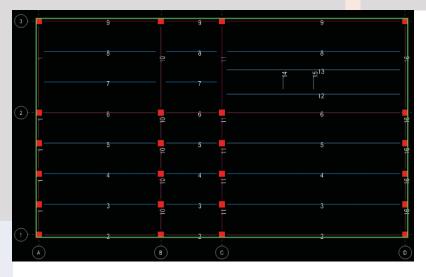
Floor plan of structure with uneven bay widths. Beam line numbers are shown.
